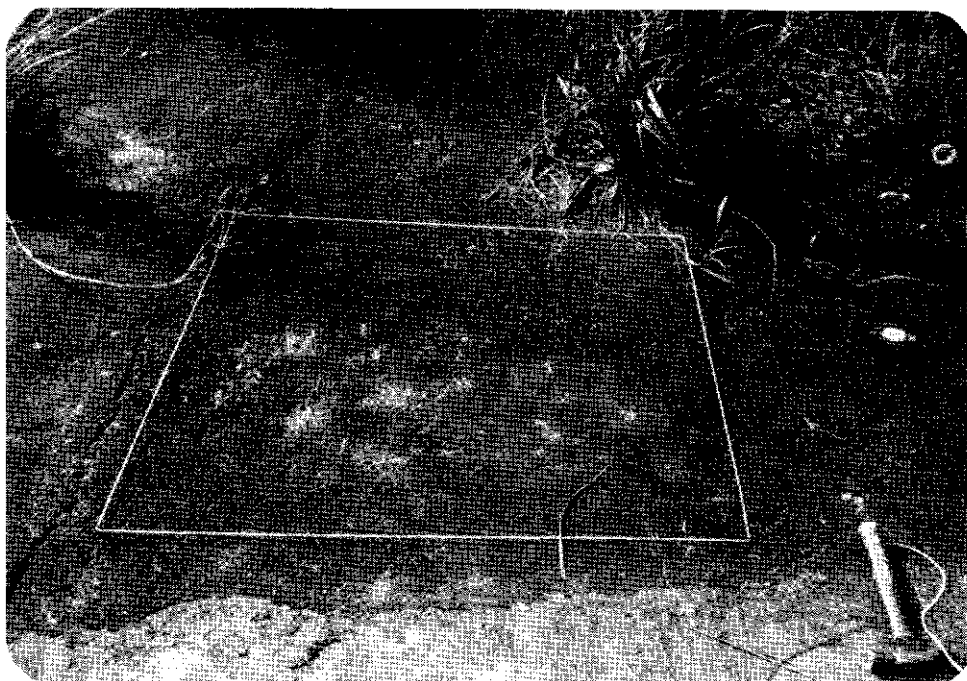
Crack survey - slope 102 - see table 5.3
